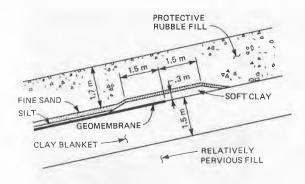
TYPICAL DETAIL AT OUTER EDGE OF GEOMEMBRANE
